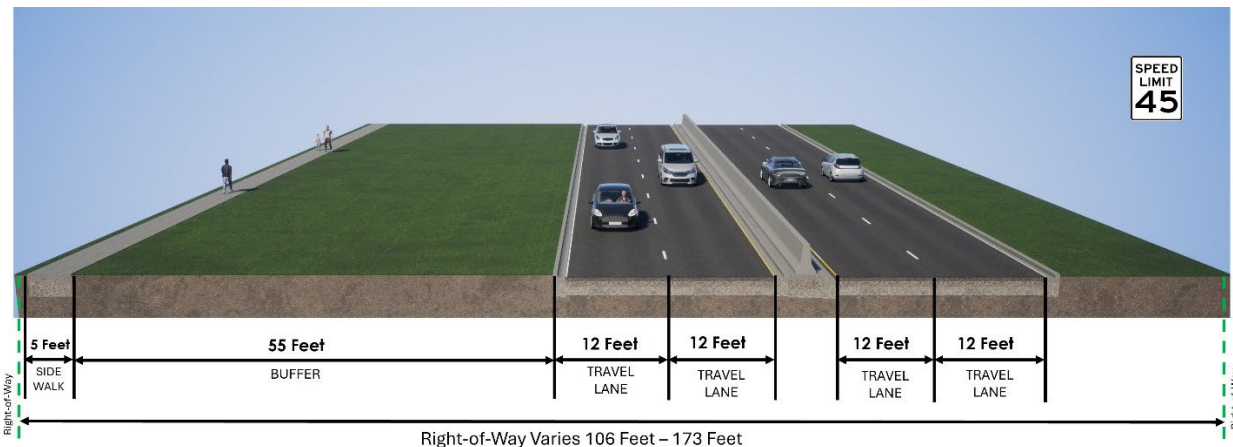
Existing Roadway South of DeSoto Bridge
